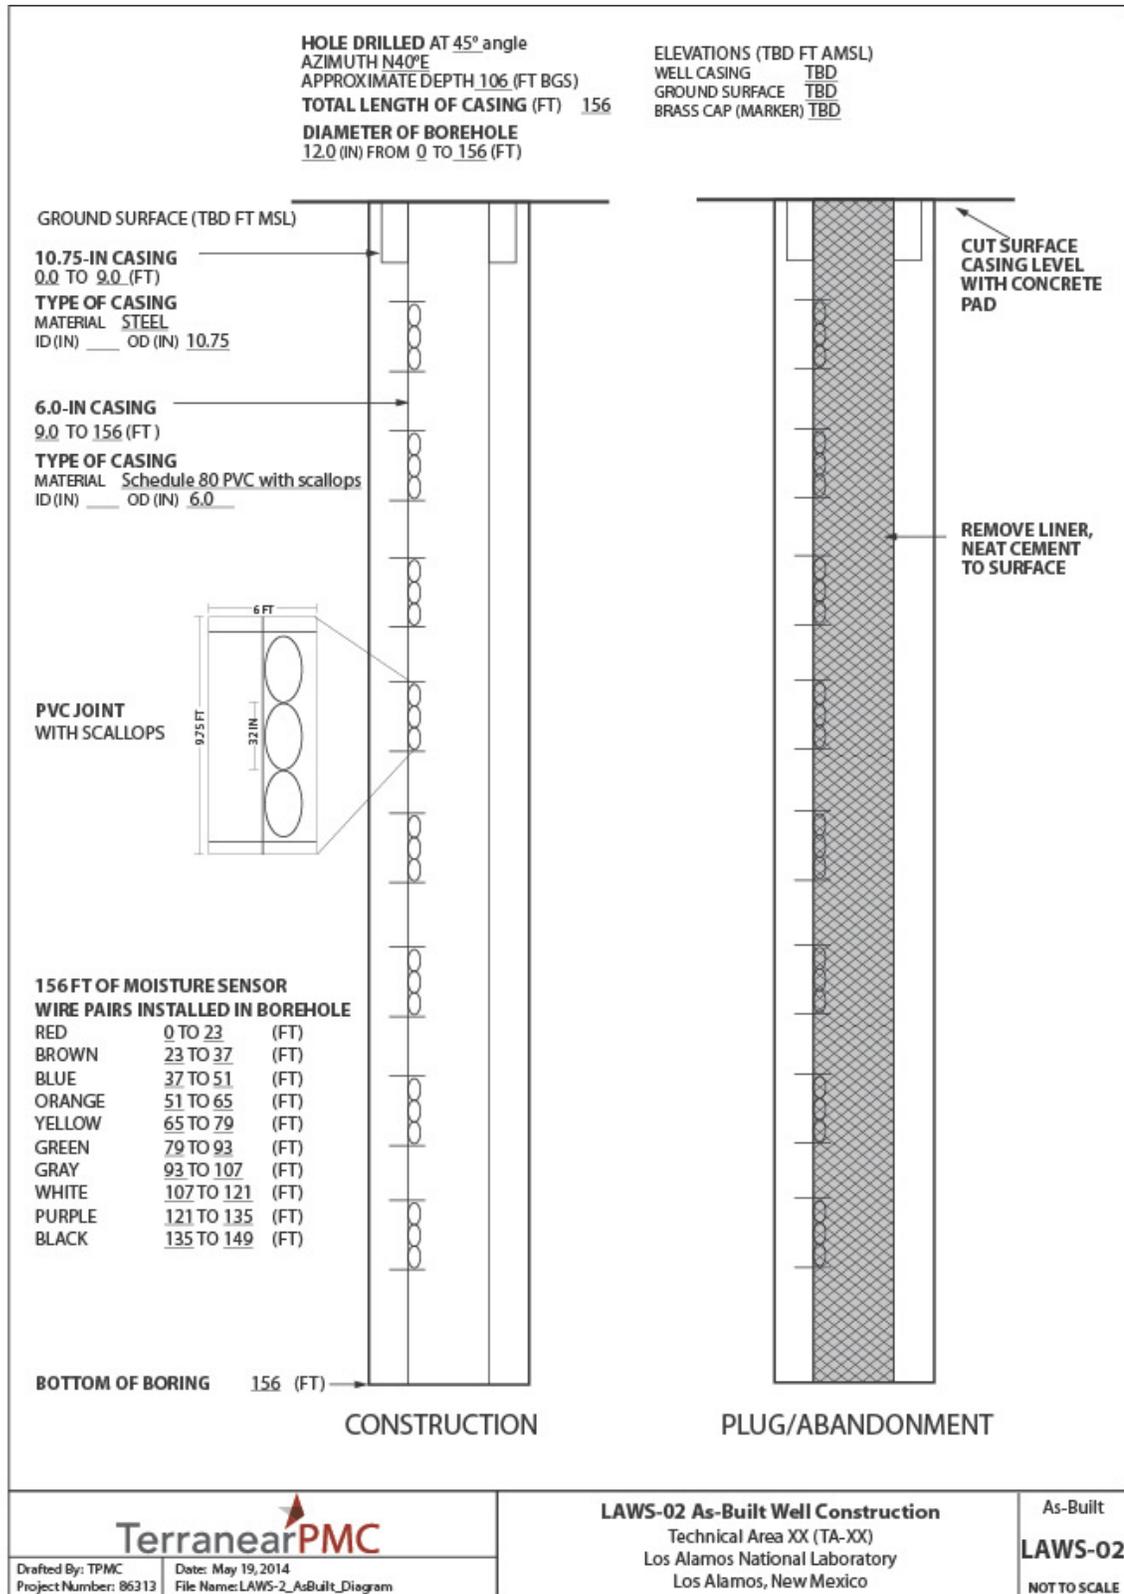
LAWS-02 Well Construction and Proposed Abandonment
